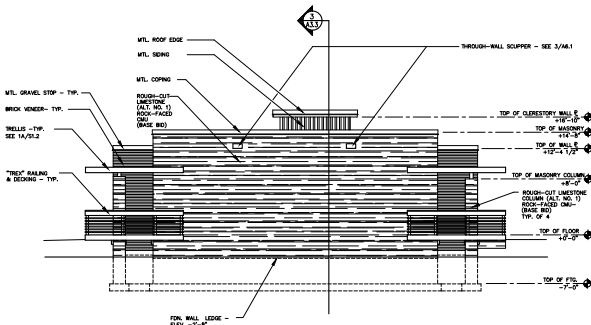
LONI West Elevation. From Waggoner and Wineinger Architects.
